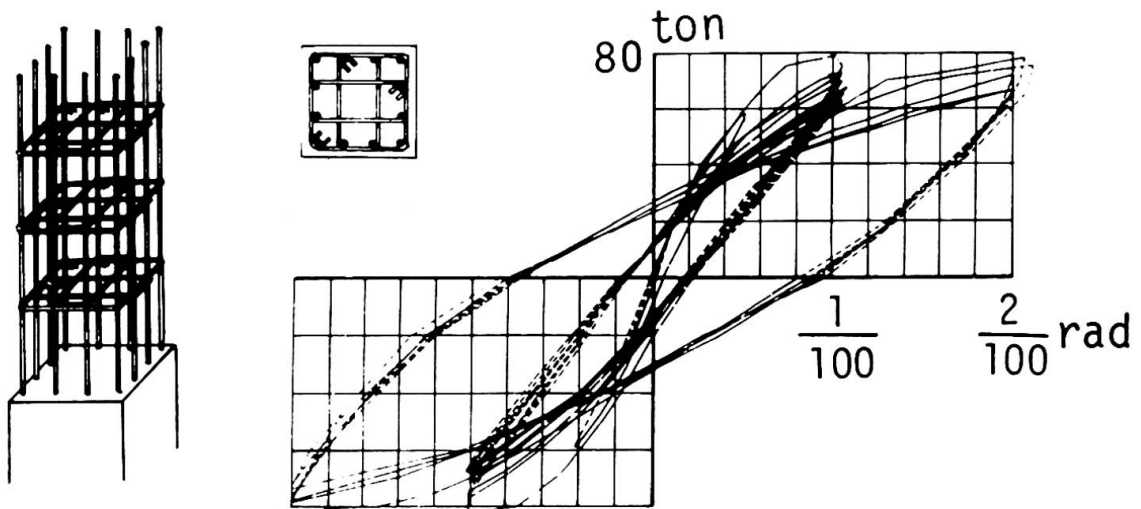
Shear-Deflection Hysteresis Loop of Tied Column Used in the 4-Story Garage Building
